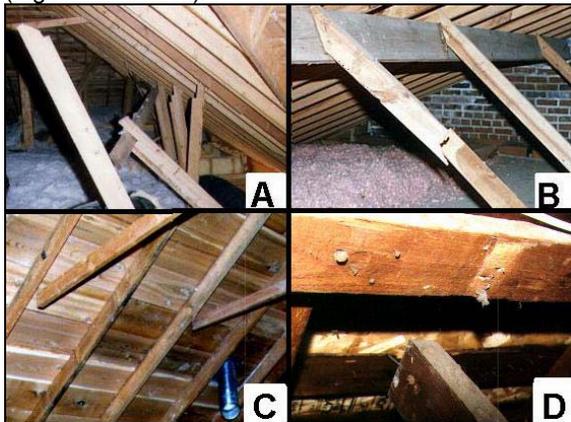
Wind damage to the roof structure: A) failed nailed connections where purlins were attached to rafters, B) broken brace, C) failed nailed connections between collar beams and rafters, and D) failure of nailed connection where brace was attached to purlin.
